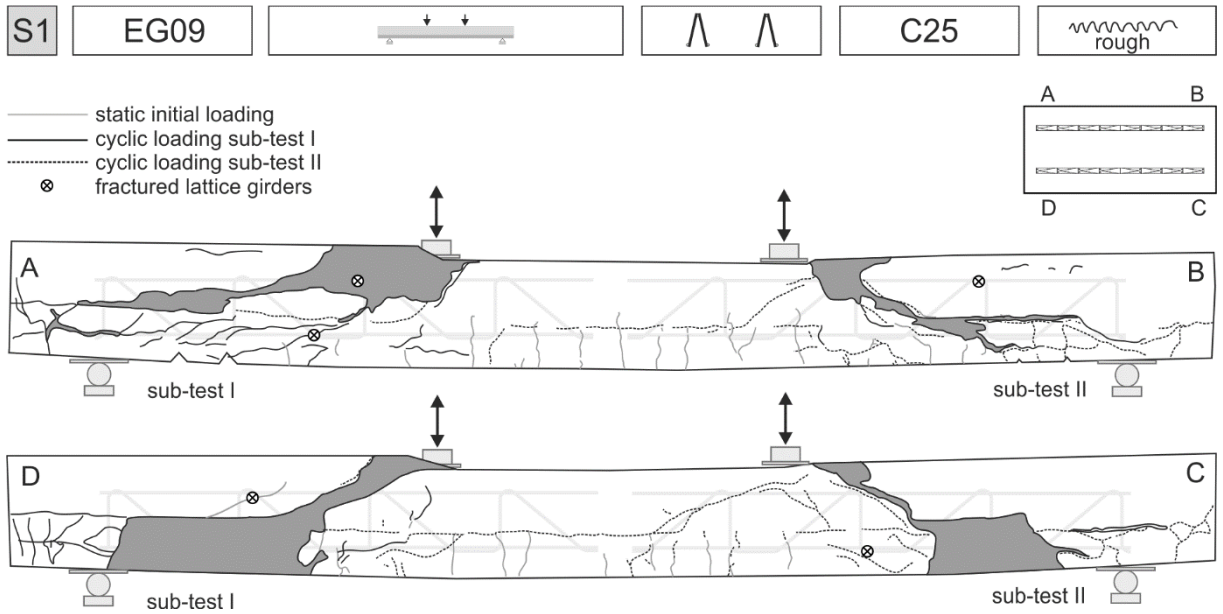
Test parameters, crack patterns and lattice girder fractures of specimen EG09
